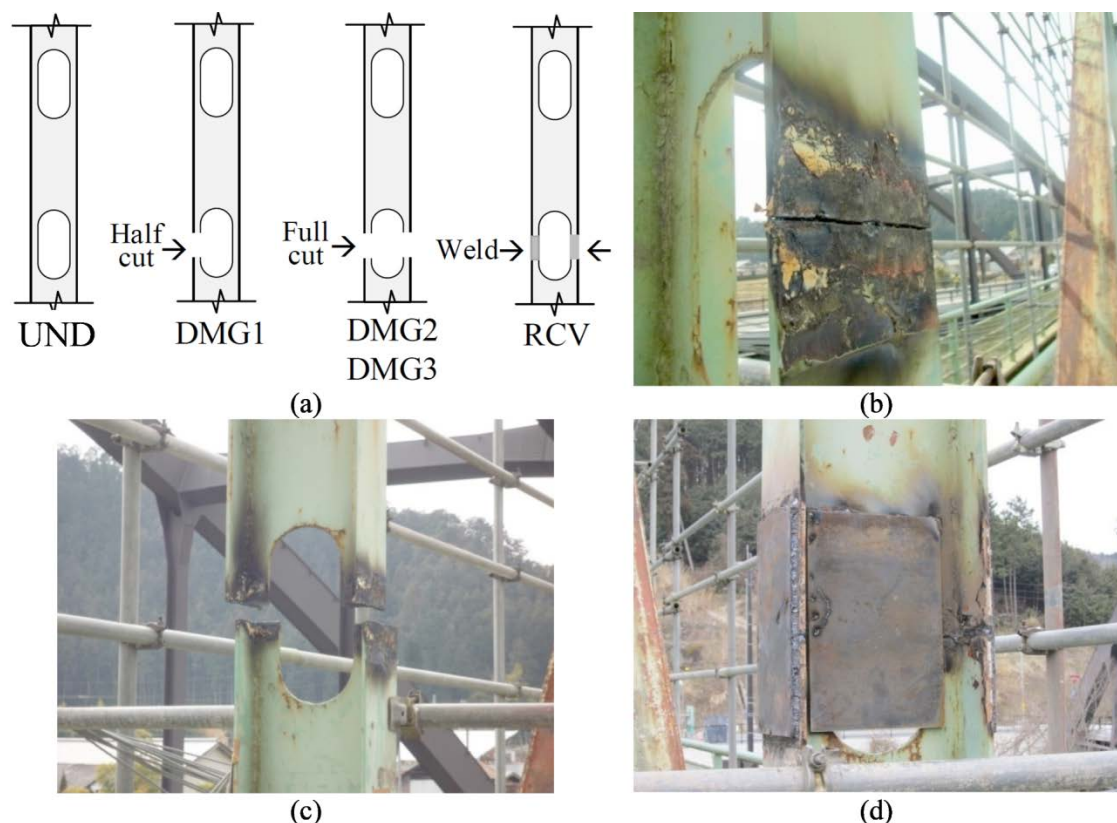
Damage scenarios carried out in the steel truss bridge (a) sketch (b) Half cut in vertical member (DMG1) (c) Full cut in vertical member (DMG2 and DMG3) (d) Mid-span member reconnected (RCV).
